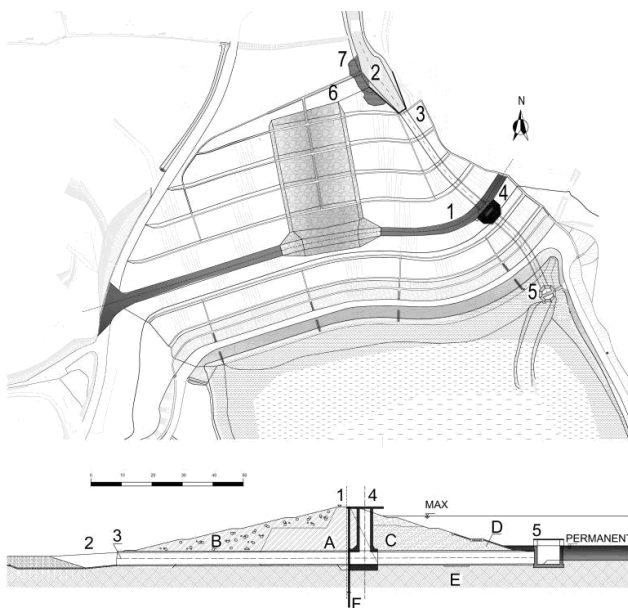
The Drtijiščica dam ground plan and characteristic cross-section (1-crest of dam, 2- stilling basin, 3- bottom outlet, 4- gate chamber, 5- shaft spillway, 6- spillway chute, 7- scour hole, A- core, B- clayey gravels, C- soil, D- riprap, E- foundation of dam, F- grout curtain)
